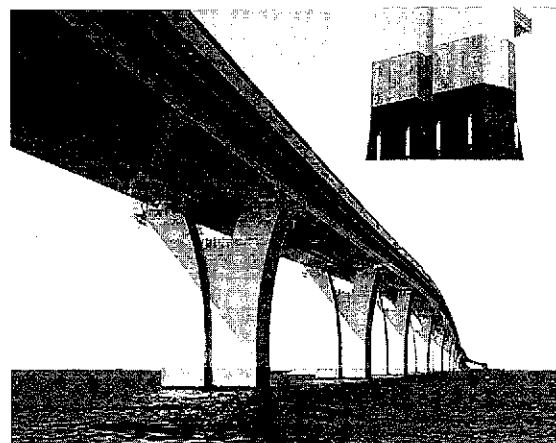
Titanium-clad steel plates used on piers of Trans-Tokyo Bay Highway Bridge
